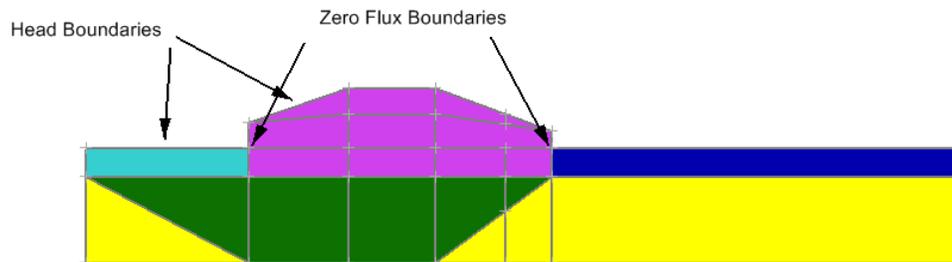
North-South Culvert Geometry (along Clear Ditch centerline). See cross-section B-B1 location in Figure 5.
